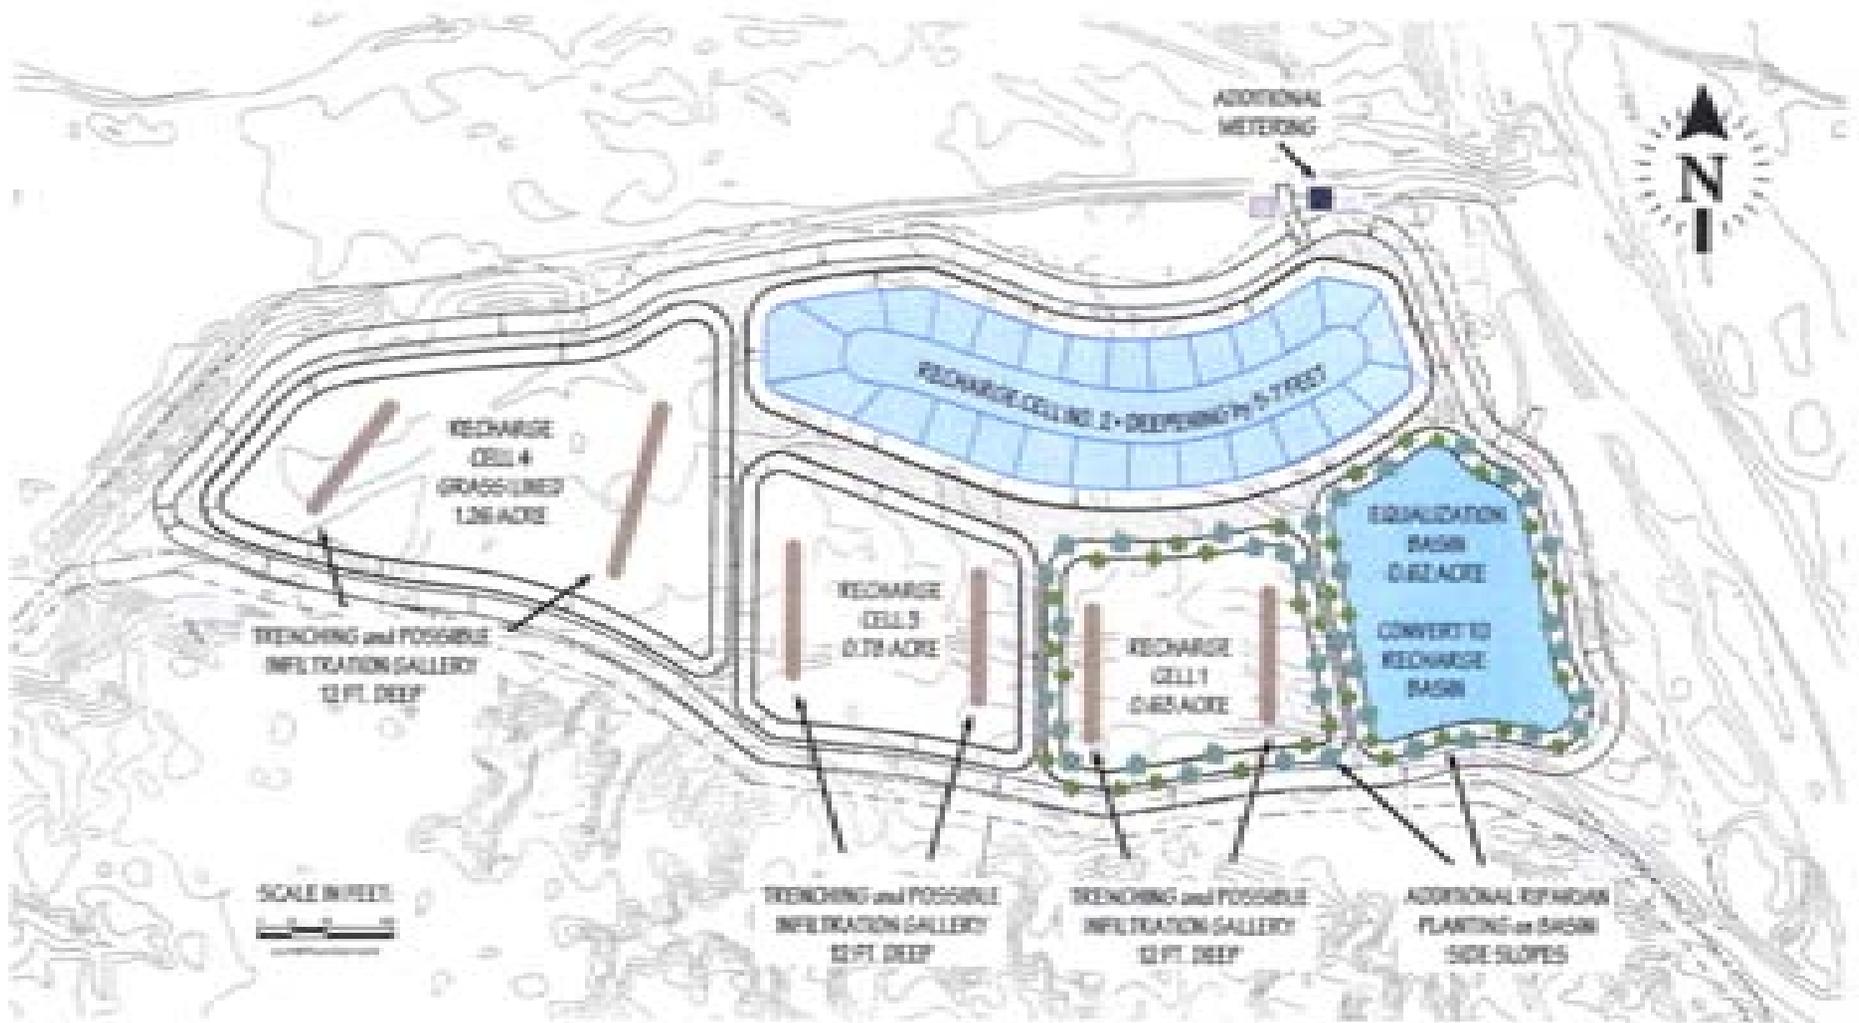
Proposed Facility Plan for Future Permit (2008)
